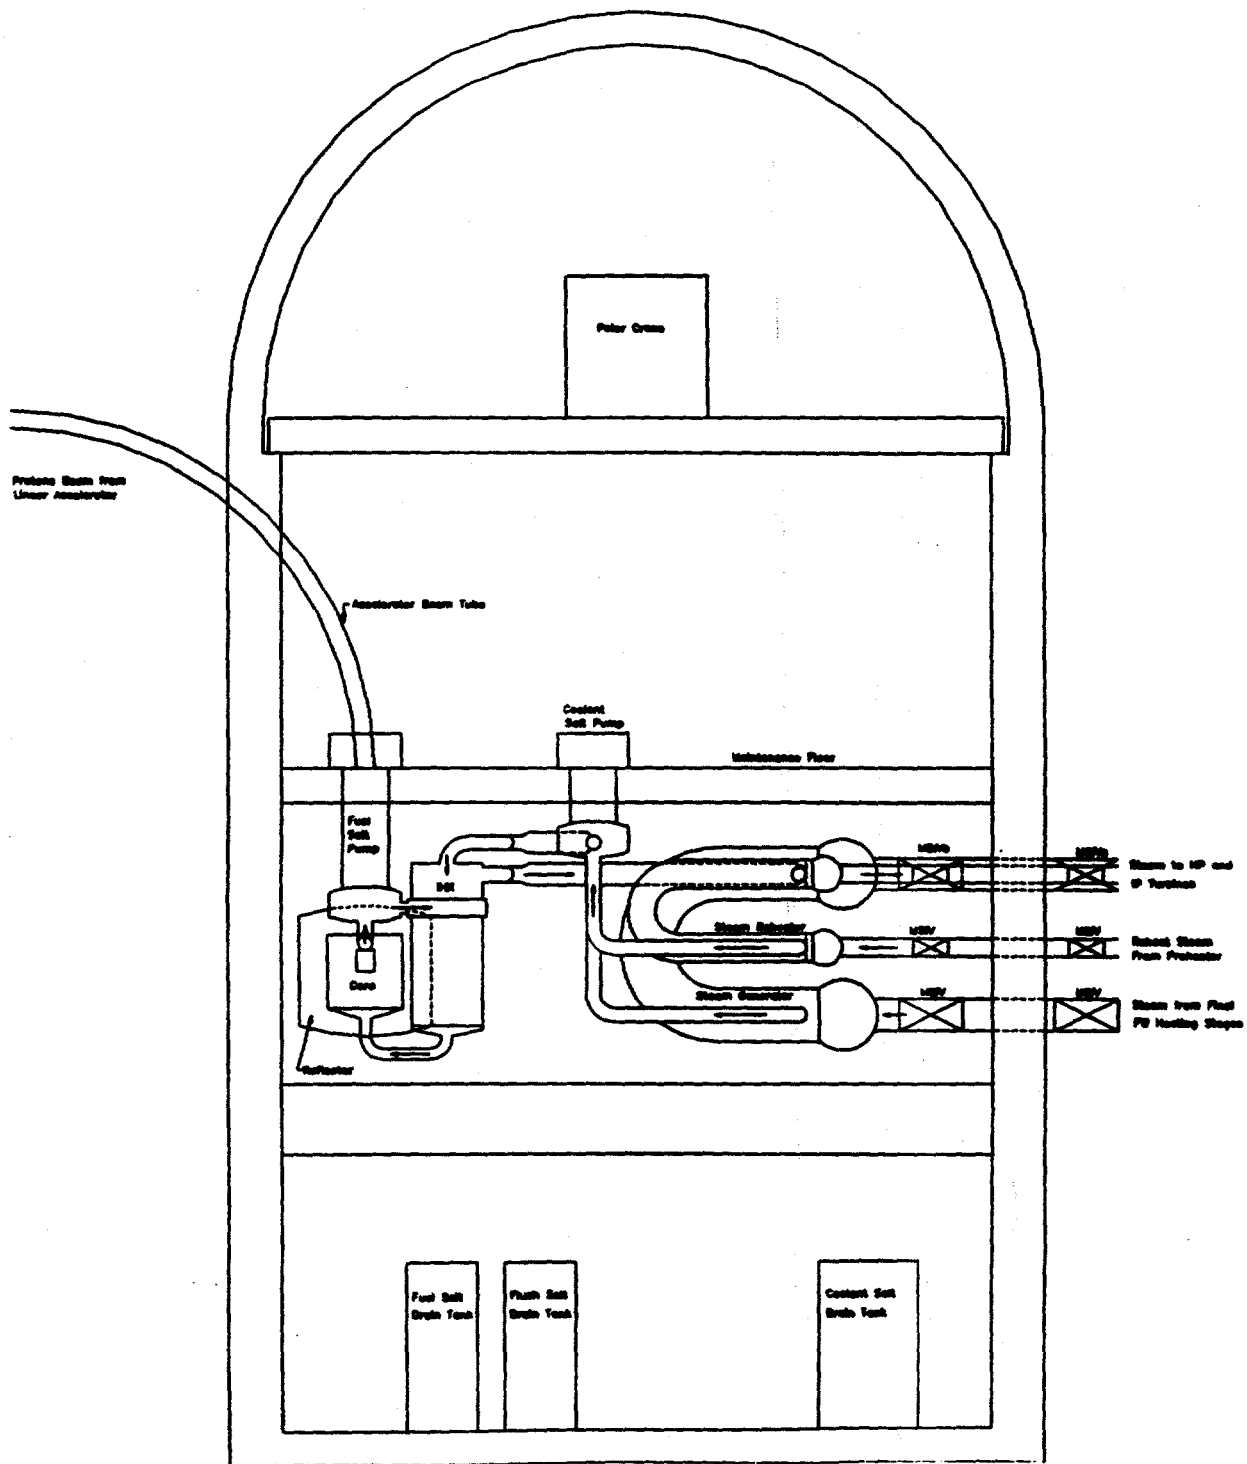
A. Plan and elevation views of ABC plant layout: Elevation view.
